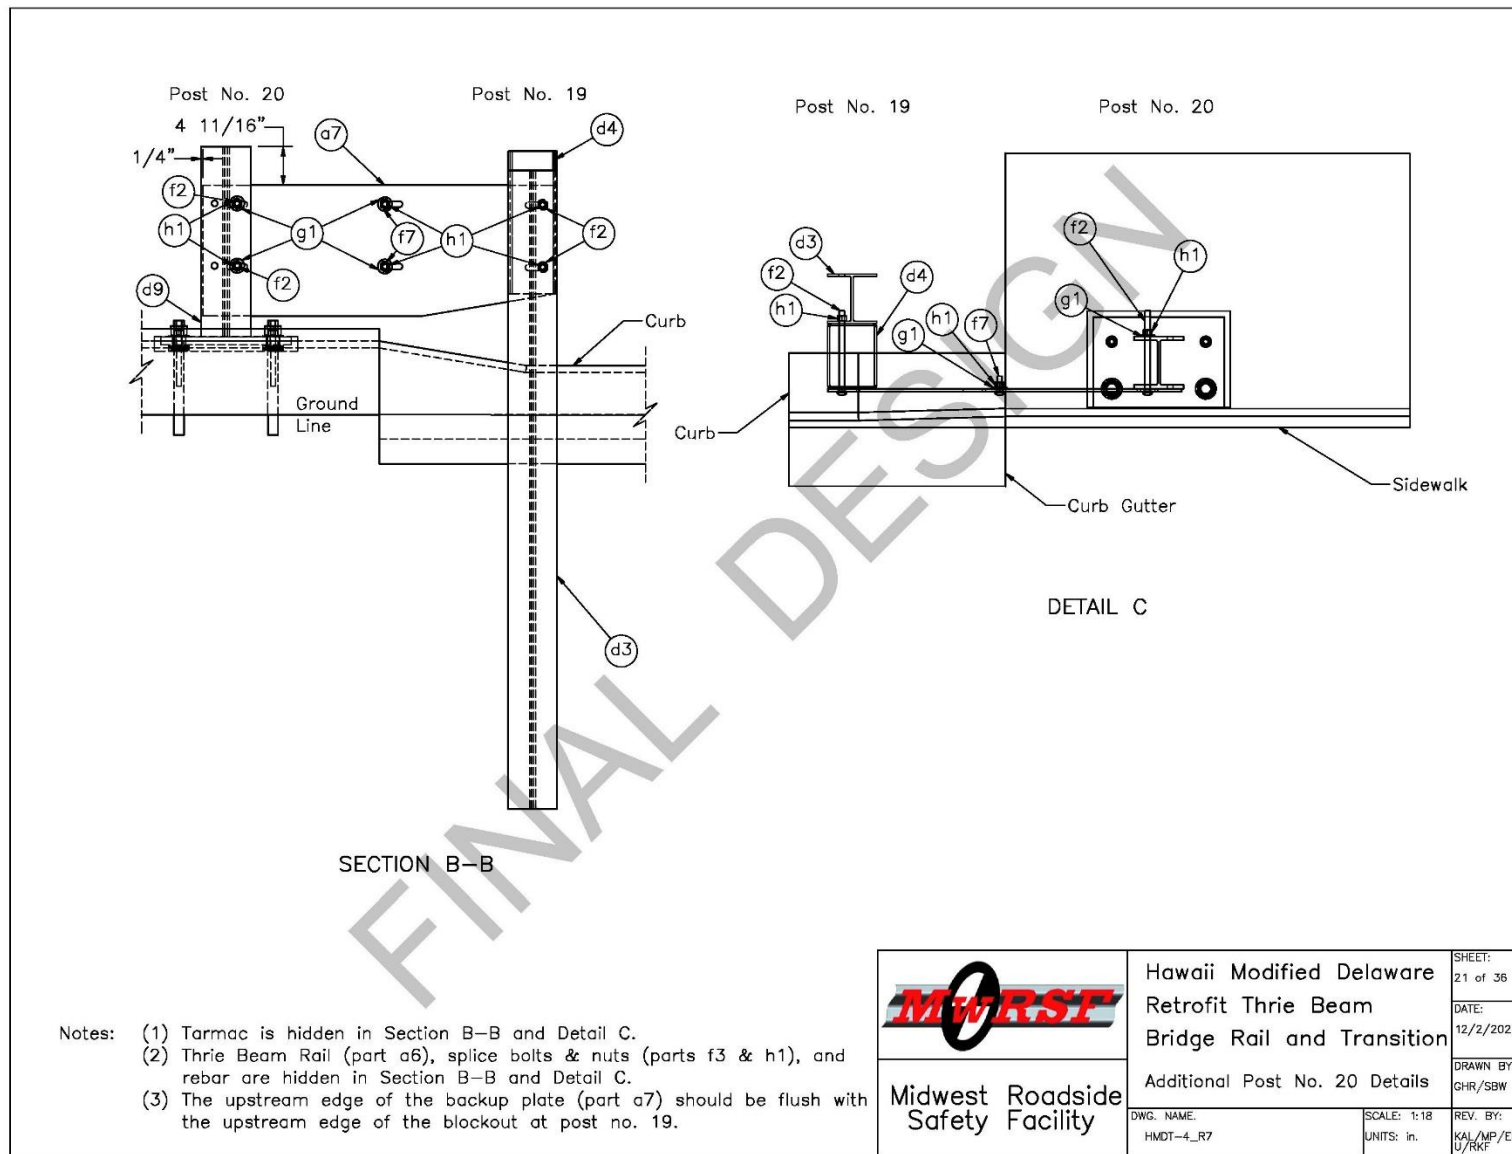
Additional Post No. 20 Details, Test No. HMDT-4
